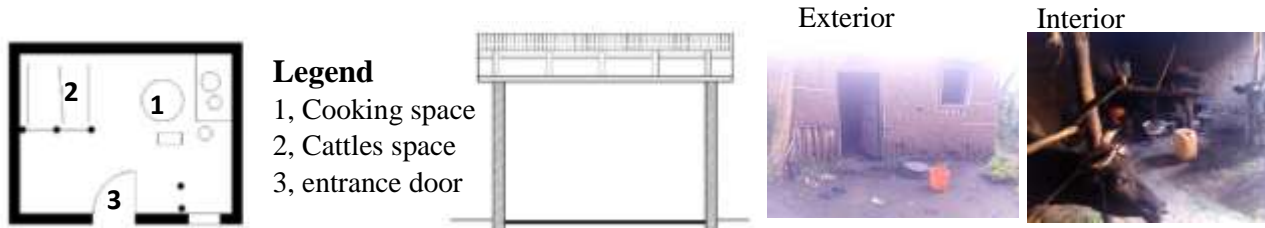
Ato Tadesse's kitchen and cattle space plan, section and pic
